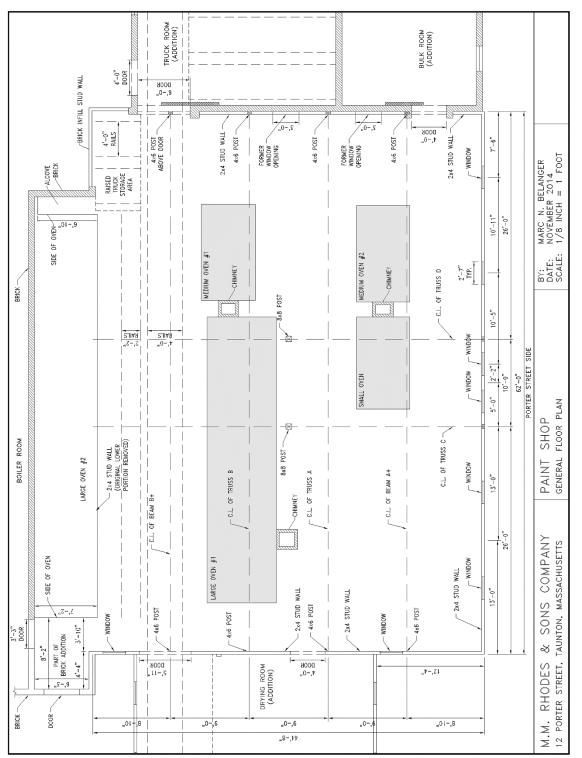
Measured Drawing. Paint Shop General Floor Plan.
